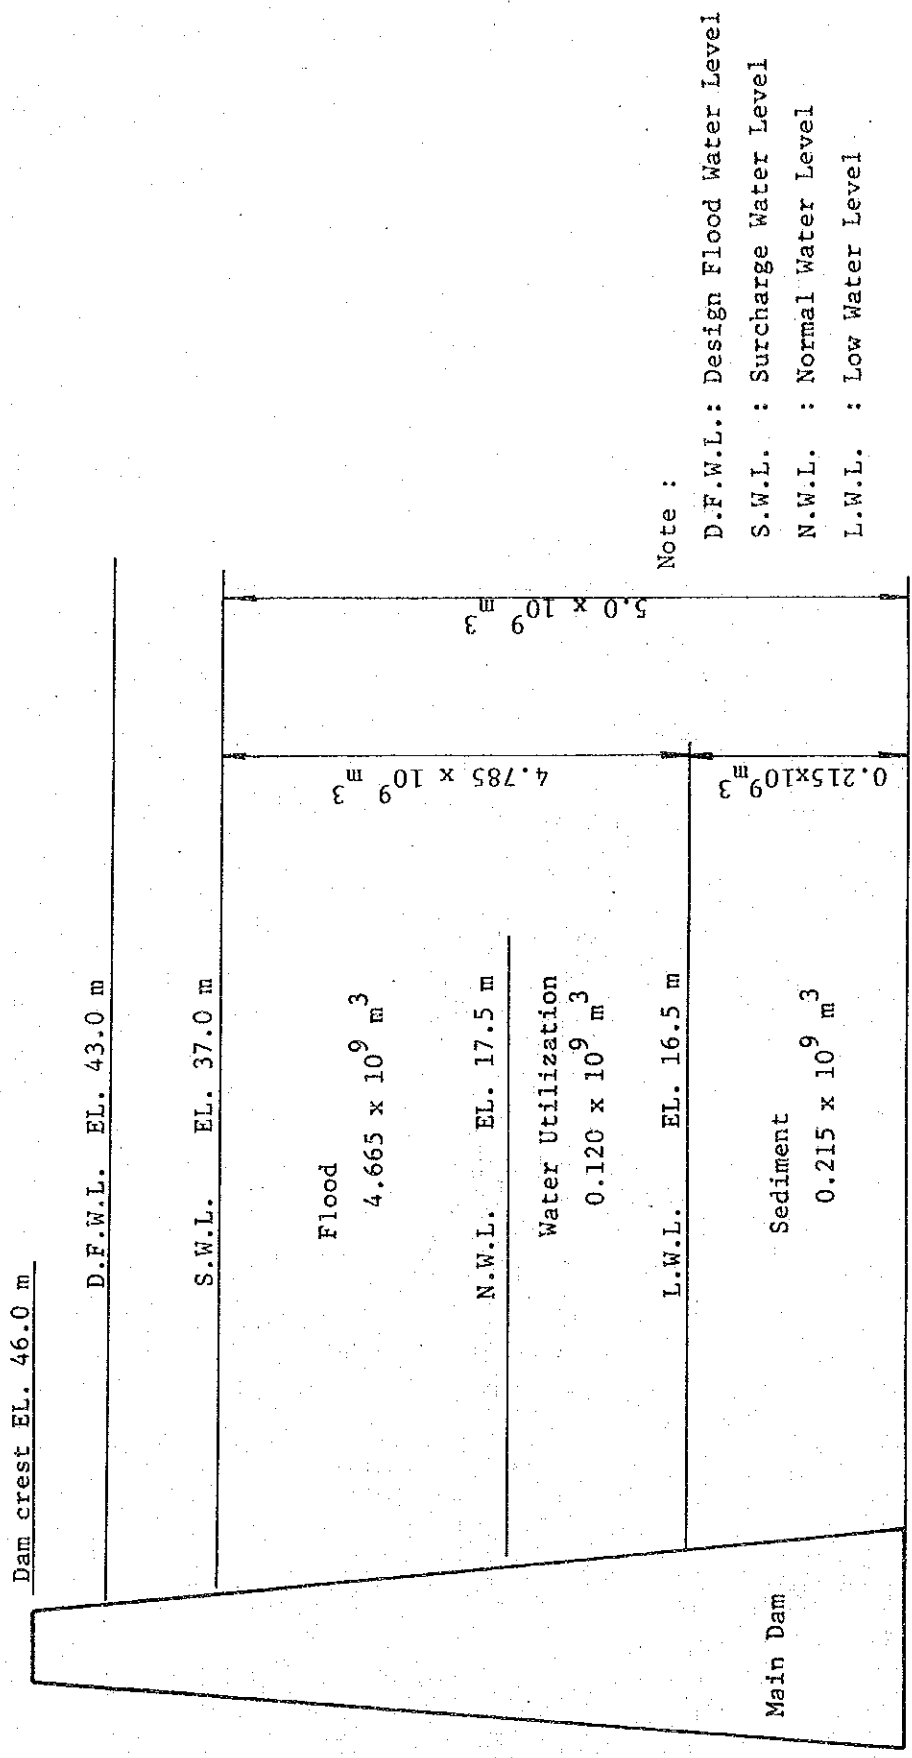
ELEVATION, STORAGE VOLUME AND SURFACE AREA
